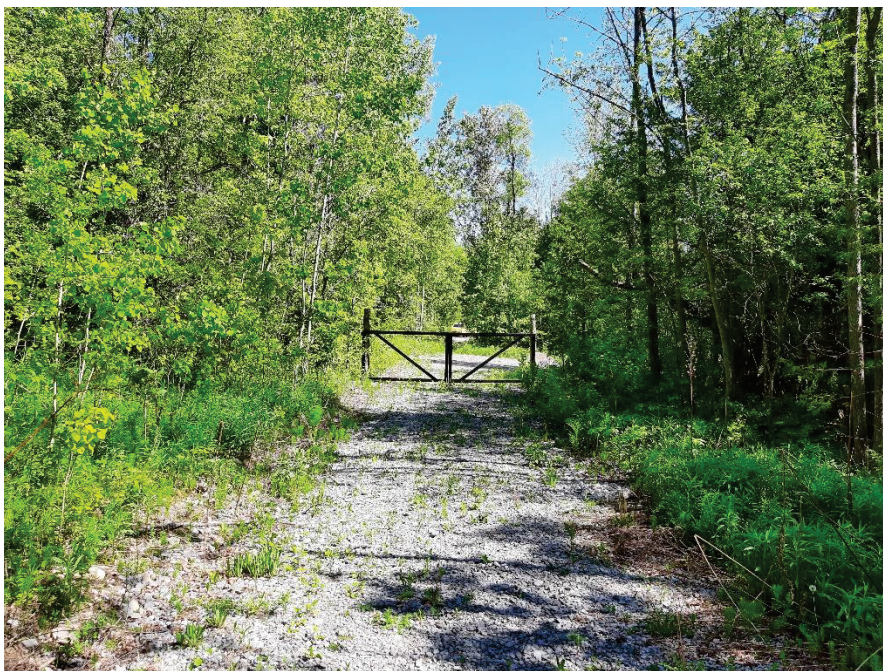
View of newly created access roadway and entrance gate; View looking northeast, May 2023
